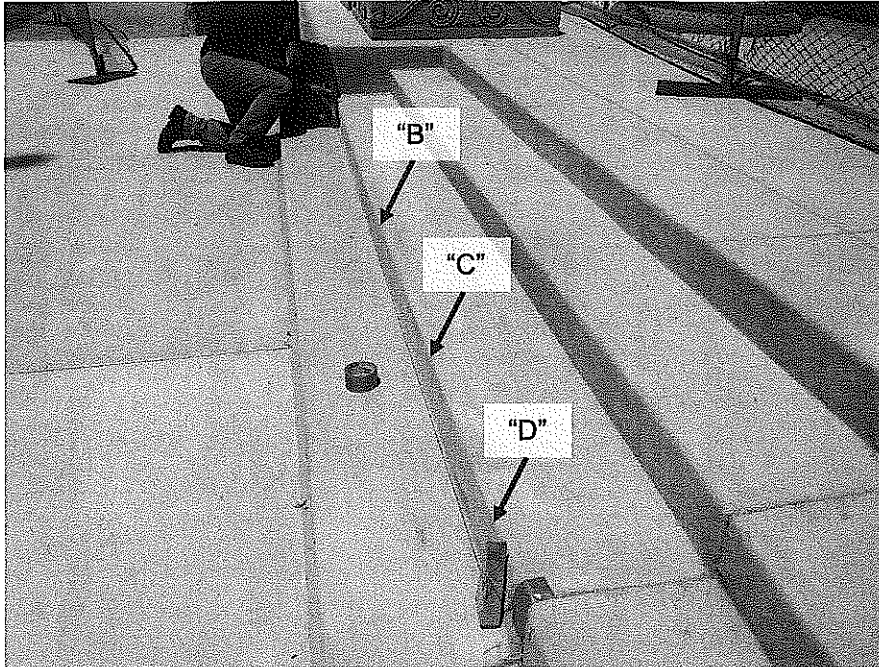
OVERALL PHOTO AT STAIRWAY A, NORTH SECTION
